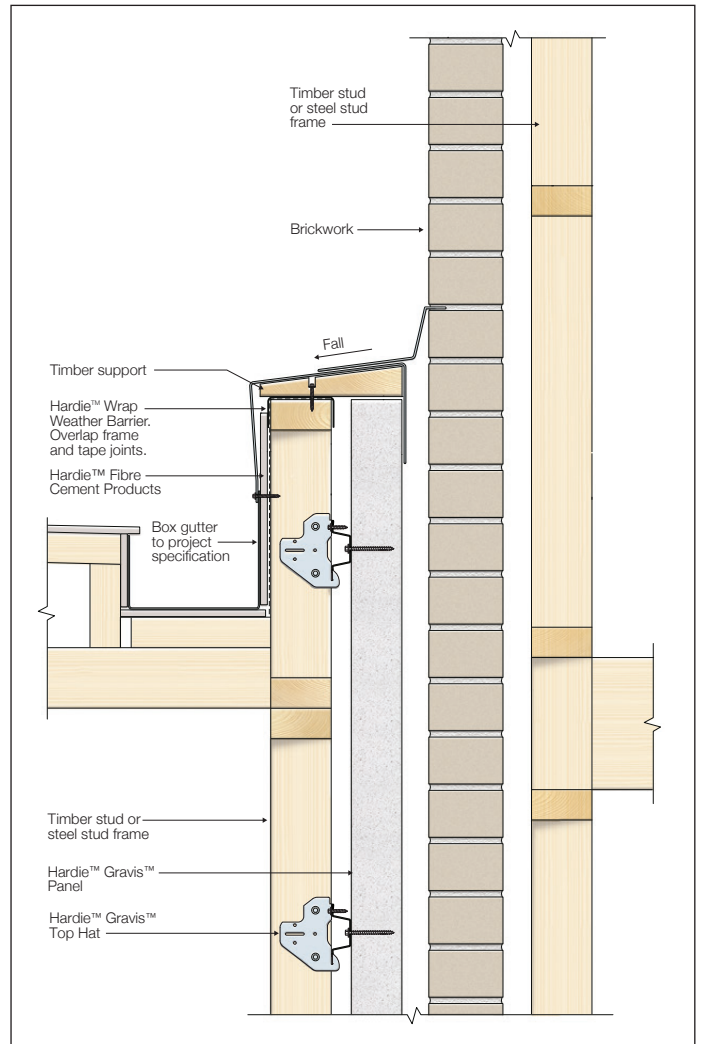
ZERO LOT WALL TO BRICK VENEER DETAIL
